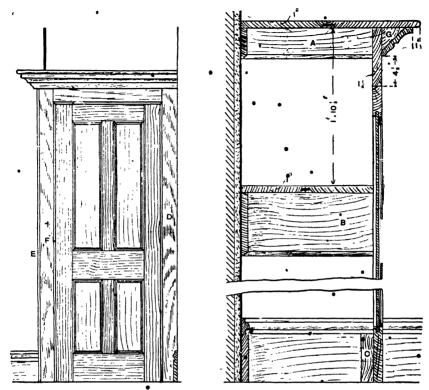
Front Elevation of Dress Cupboard for Bedroom Recess.
